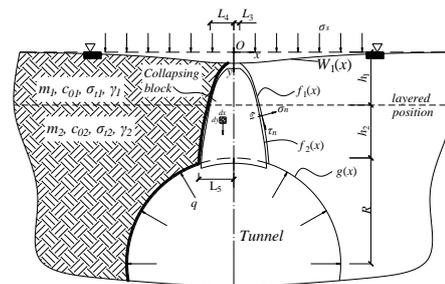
Collapse of shallow tunnel under ground surface settlement in layered soils
